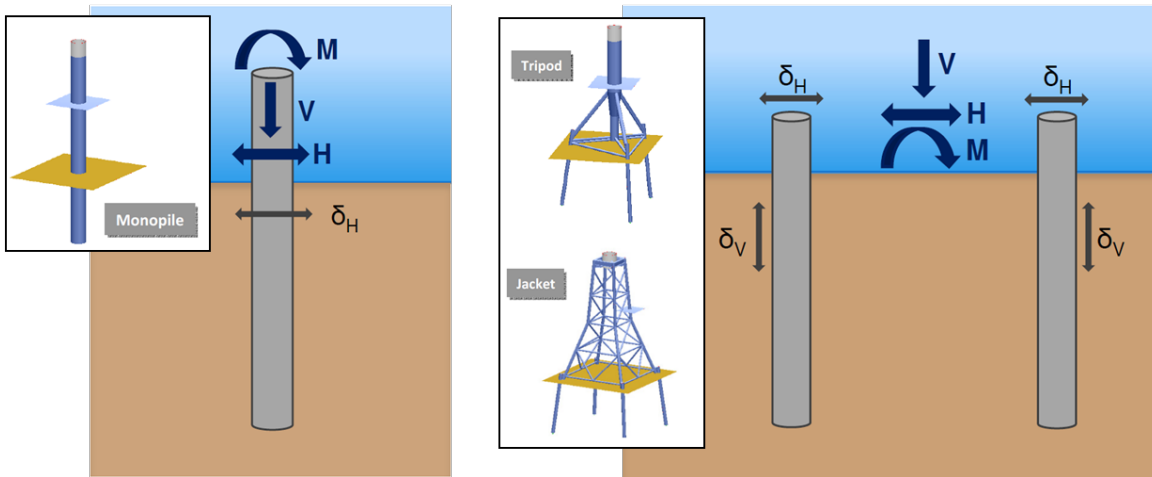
Load transfer to the soil for a mono pile (left) and tripod/jacket (right) foundations
